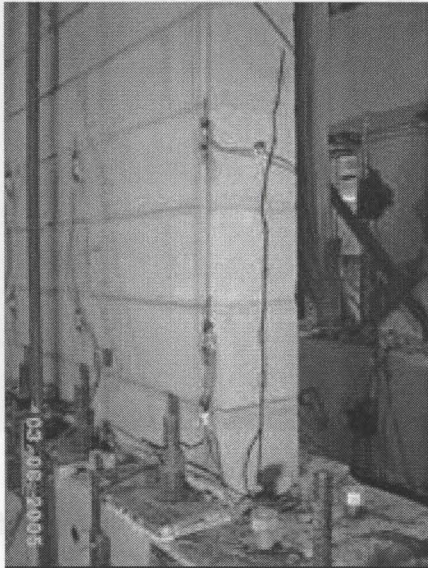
68: Cracks at 10 mm (Wall 6)
